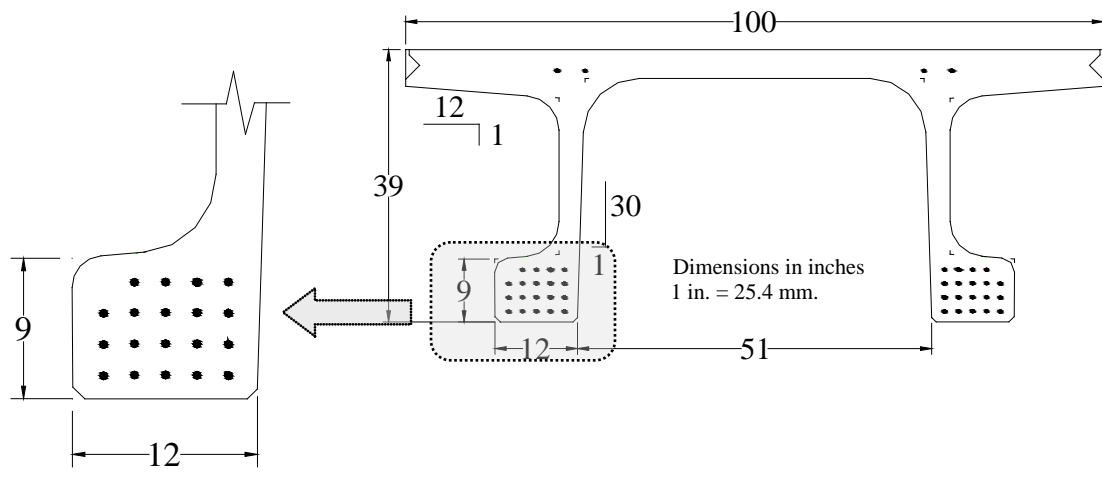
Illustration. Strand Layout of Section II for 95-foot (29.0-m) Span
